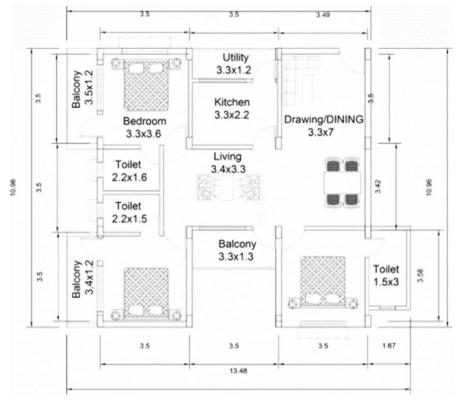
Typical floor plan for 3 BHK (1 unit)
